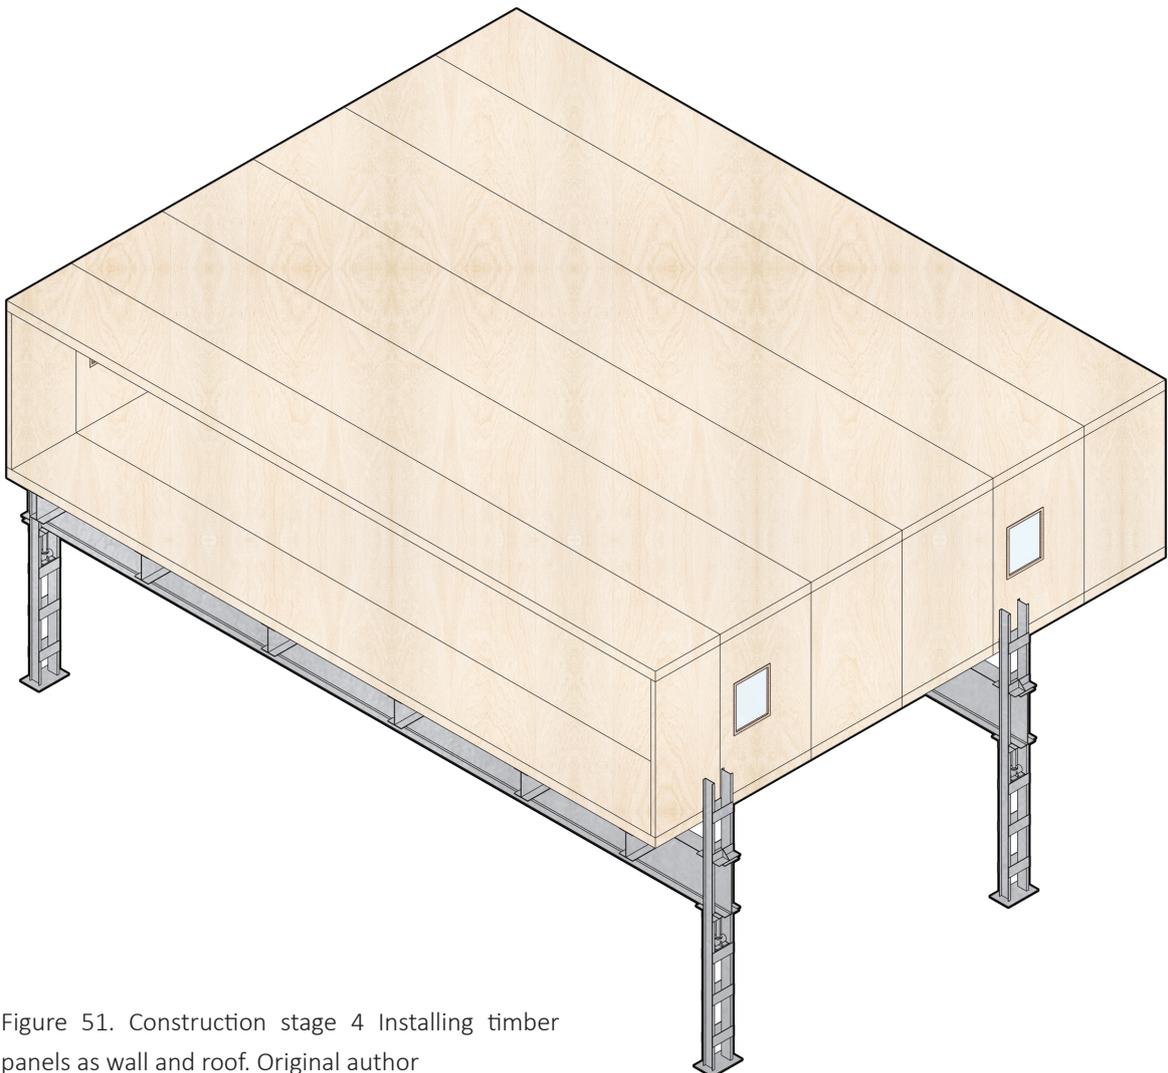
Construction stage 4 Installing timber panels as wall and roof. Original author
